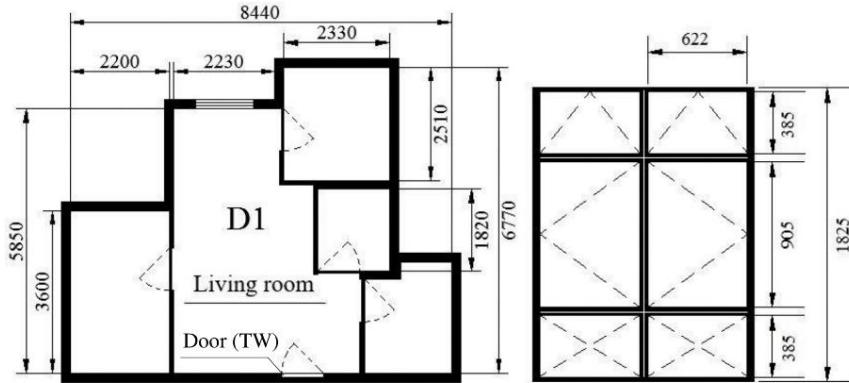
Layout of unit D1 with floor dimensions and window details.
